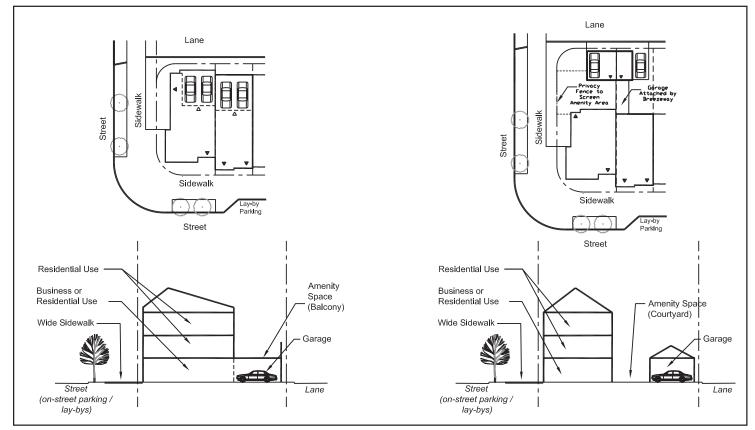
Conceptual Plan View and Cross-Section of Live-Work Townhouses
